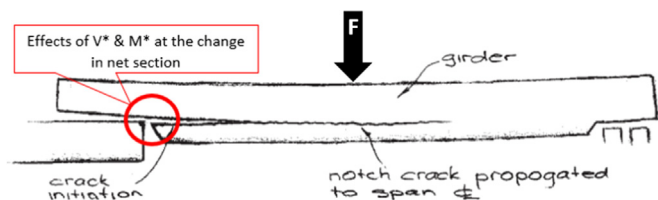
Typical failure at the notch in a timber girder [10].
